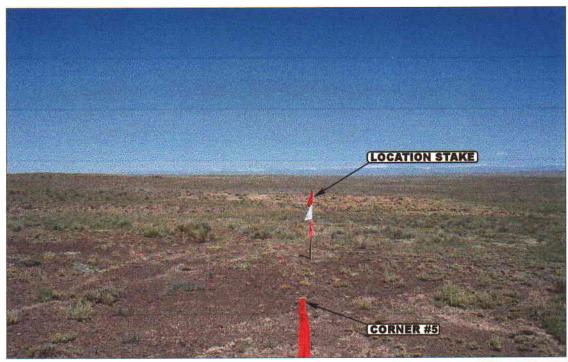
PHOTO: VIEW FROM CORNER #5 TO LOCATION STAKE
